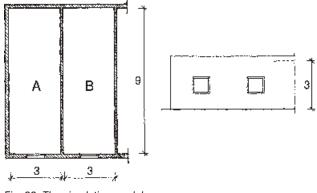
The simulation model. Two rooms in the end of a long building are studied.
